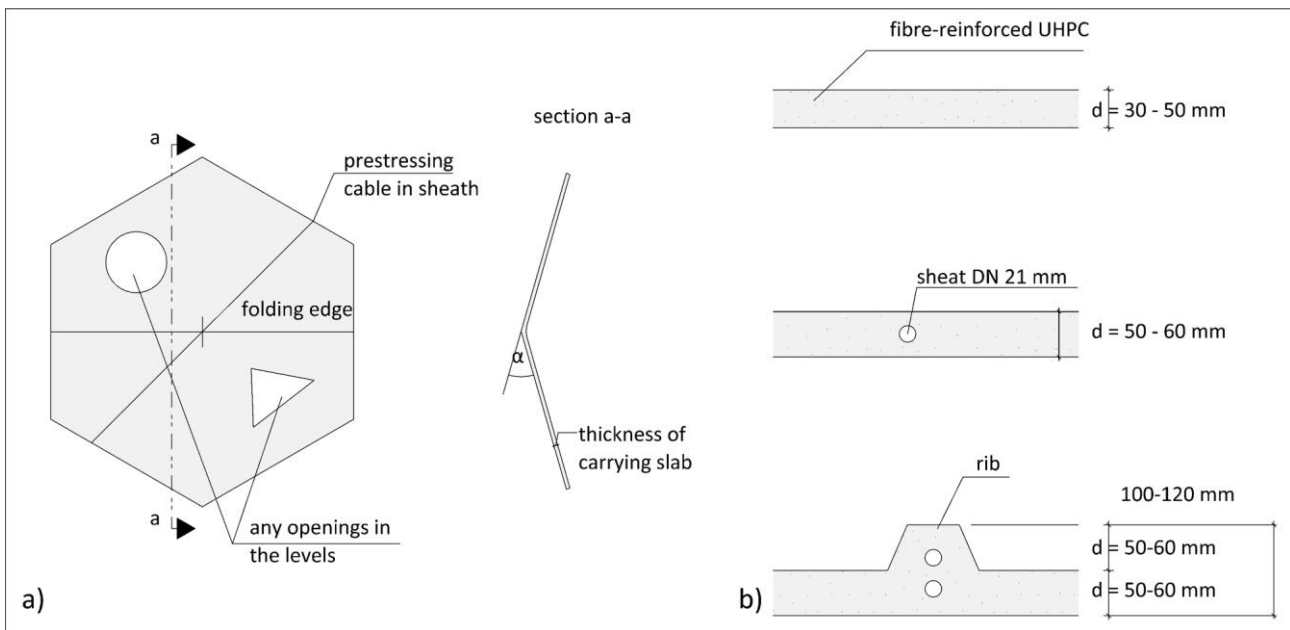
USE basic element a) Ground view and cross section b) Cross-section design
